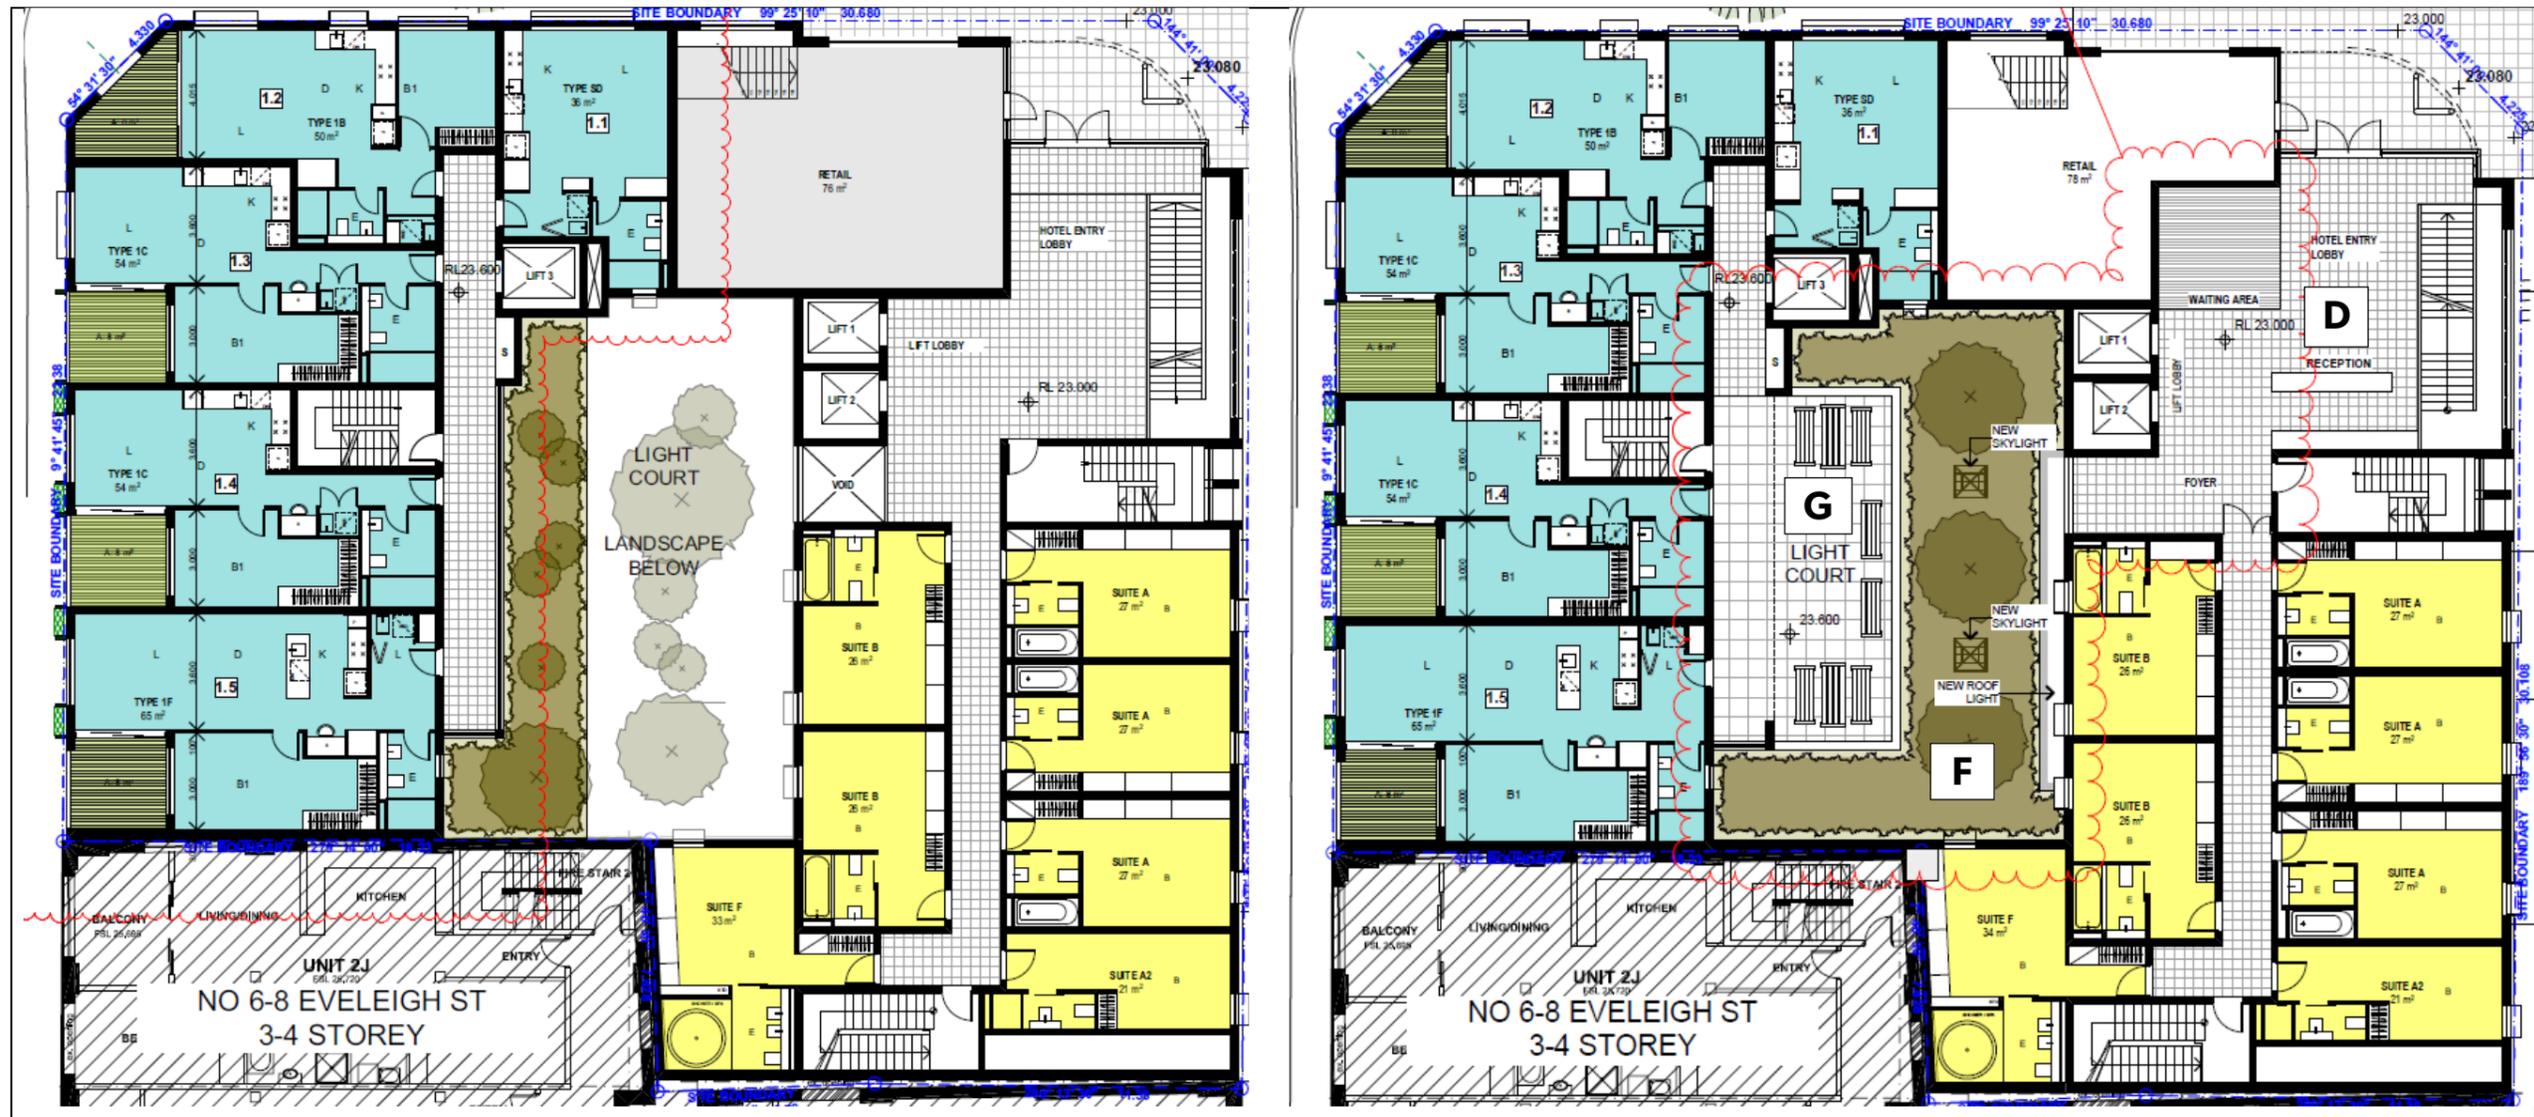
| Level 2 floor plan comparison between approved (left) and proposed (right) (Source: Approved Plan and Applicant's EIS 2018)
